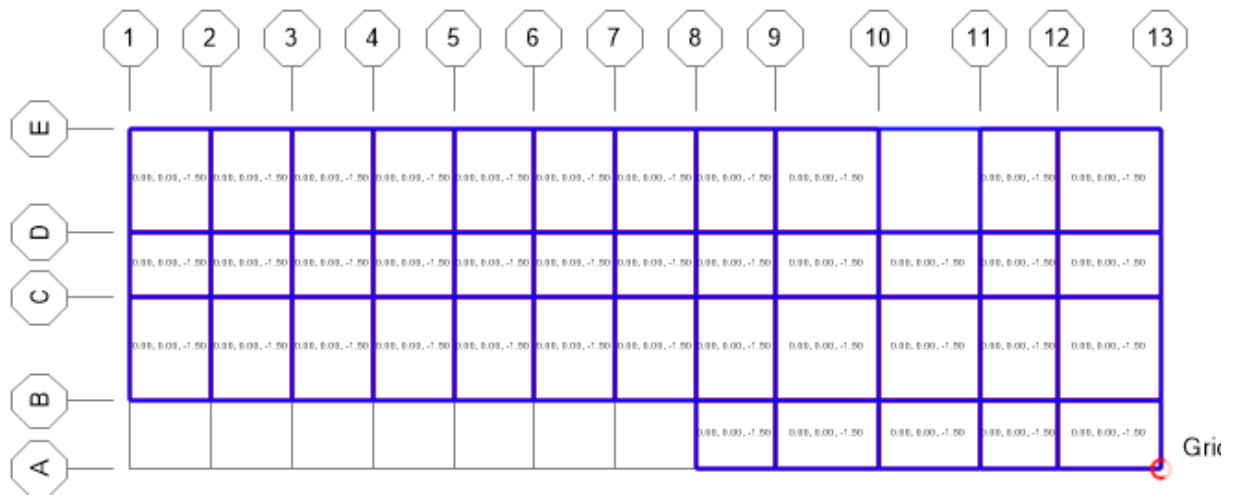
Floor Finish load at First Floor (1.5KN/m^2) (A block)
